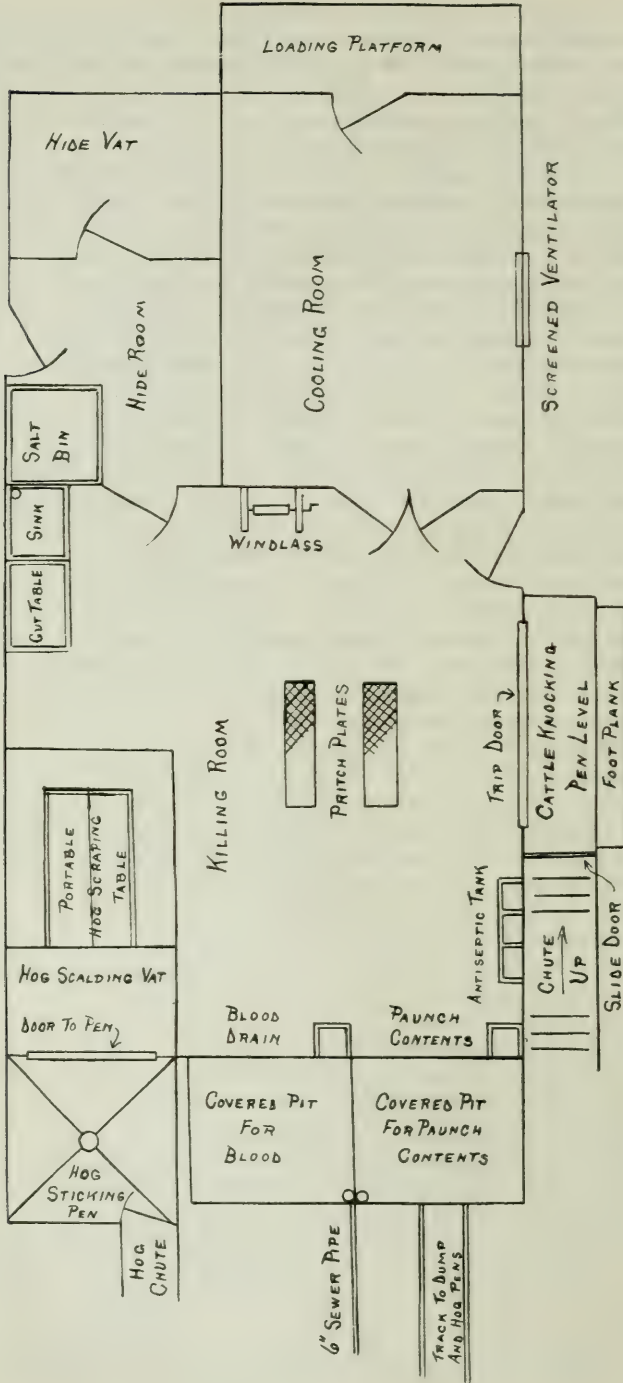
SKETCH OF THE GROUND FLOOR PLAN OF SMALL SLAUGHTER HOUSE FOR RURAL DISTRICT.
